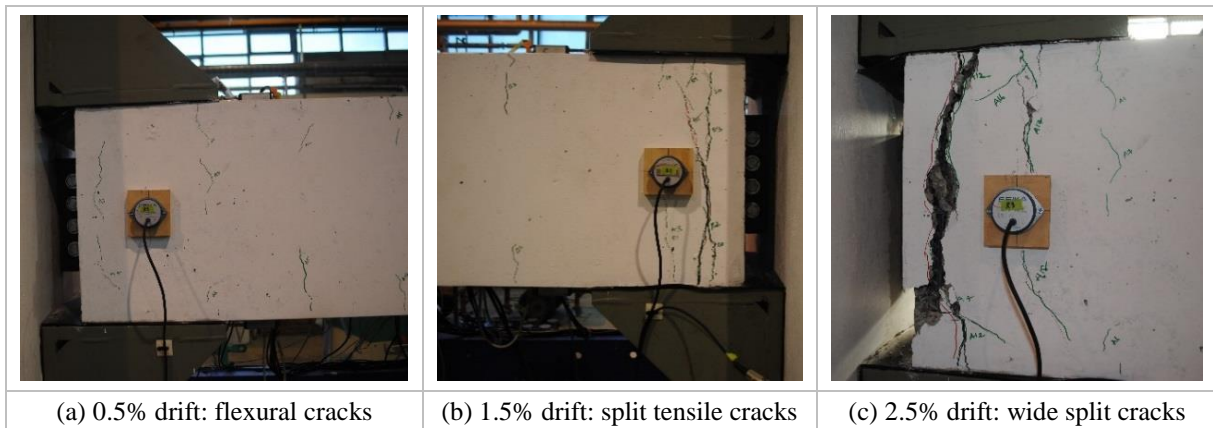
Damage state of the precast concrete beam obtained from Test-AWP1
